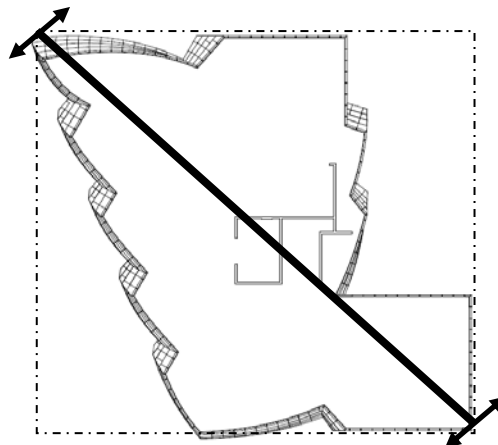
Plan showing location critical to wind pressures & simplified shape for design
